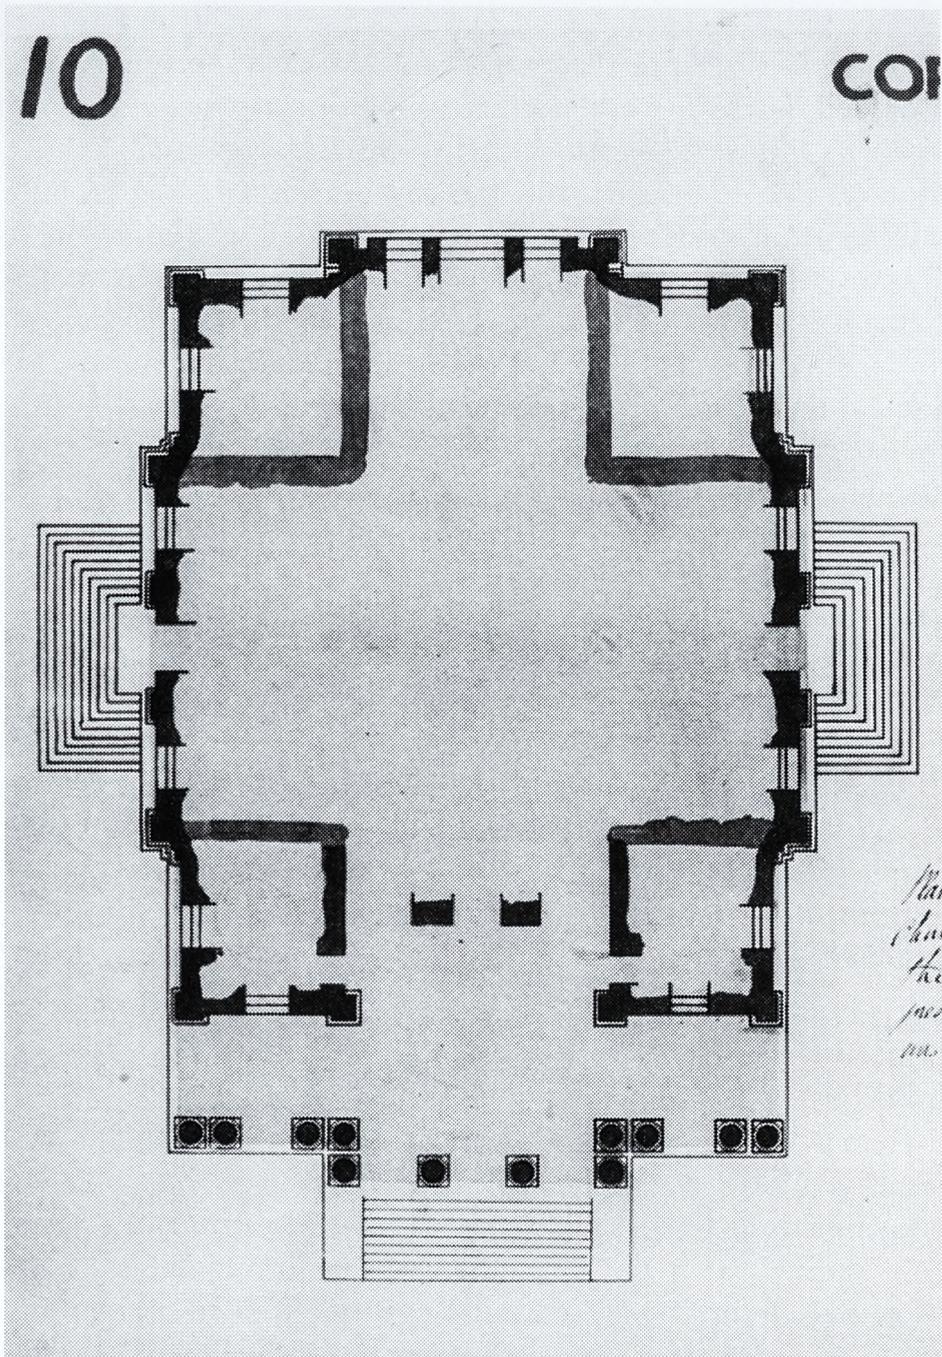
Plan of Donaldson's model No. 10. (RIBA Drawings Collection).
